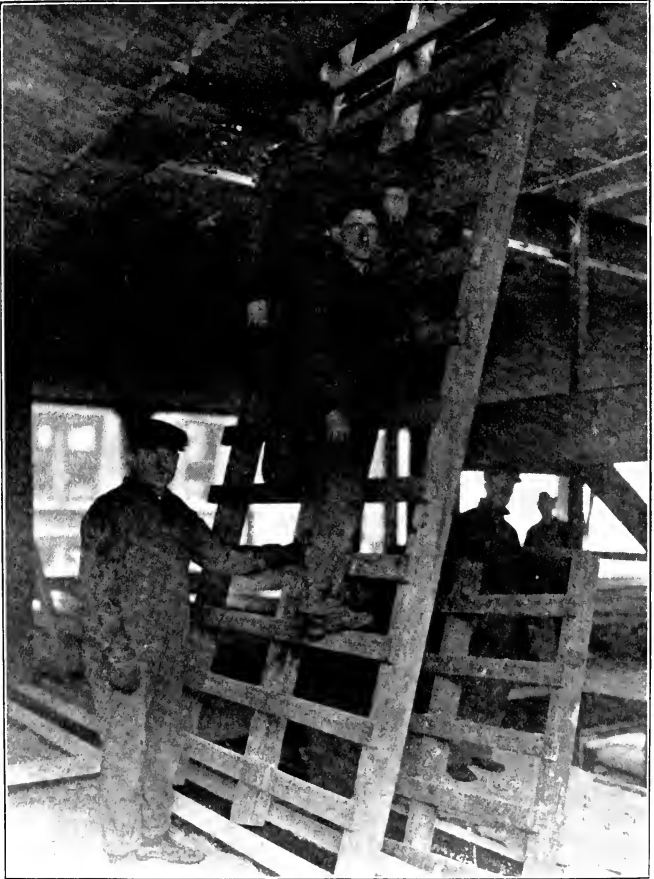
Illustration No. 54. Old method of stairs for the use of employees on structures. Note the small floor openings through which the men must squeeze in climbing from floor to floor. Compare illustration No. 55.
